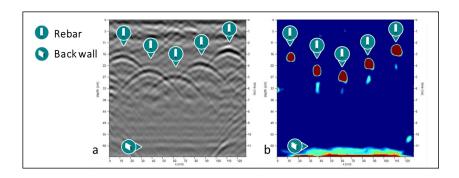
Proceq GPR Live detects all rebars, as well as the back wall
